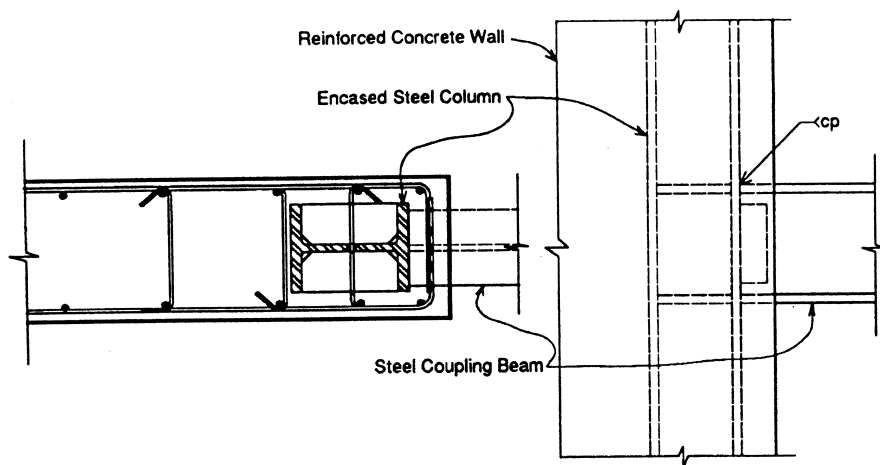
Steel coupling beam to reinforced concrete wall with composite boundary member.
